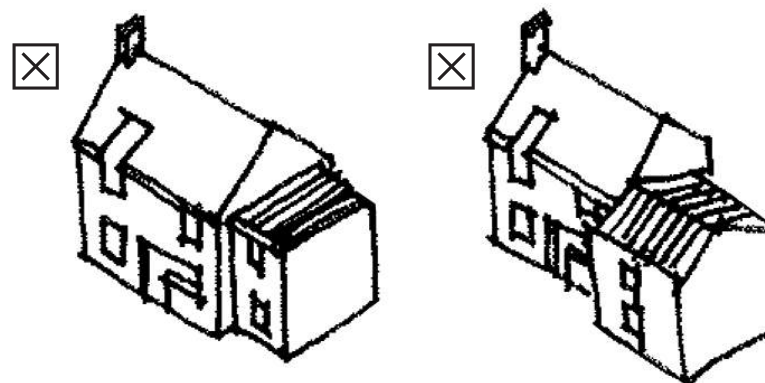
Flat roof on extension (left) does not sit well with the original ridged roof. Extension (right) is not subservient to, nor seamless with, the original dwelling. The extension also projects forward of the established building line
